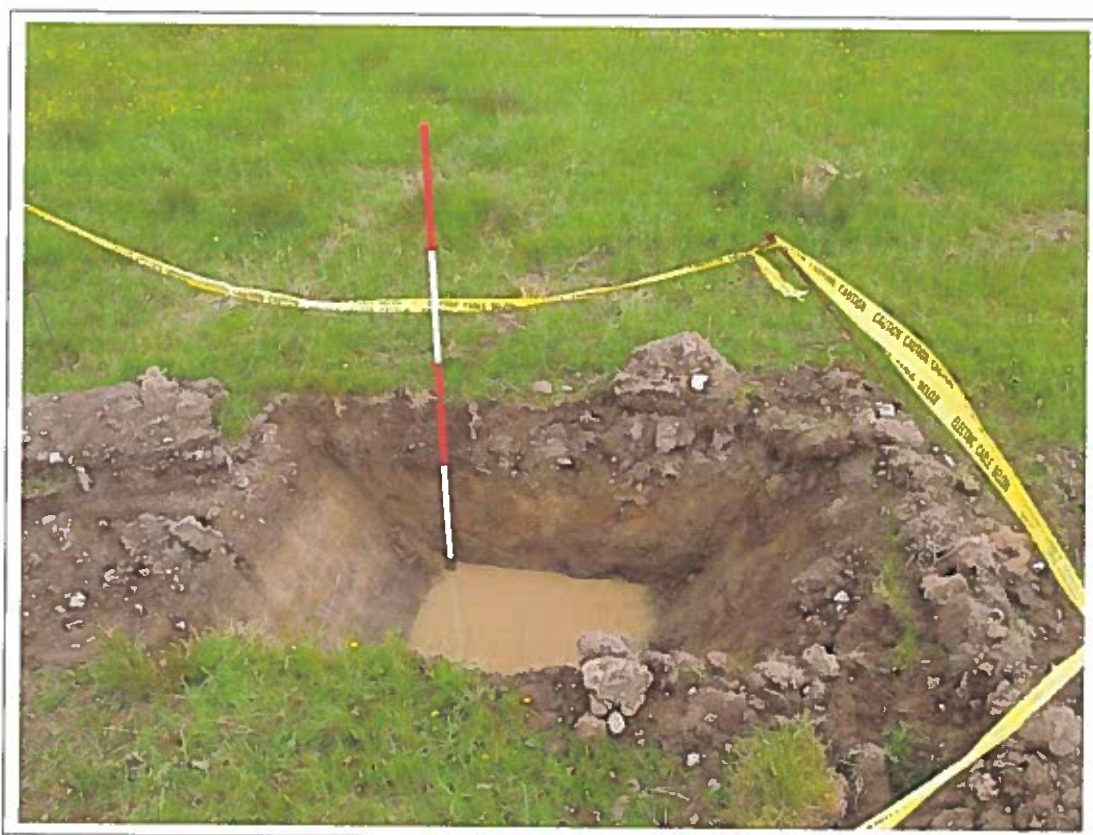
View of anchor point excavation, Scale 1x2m, Looking north east
